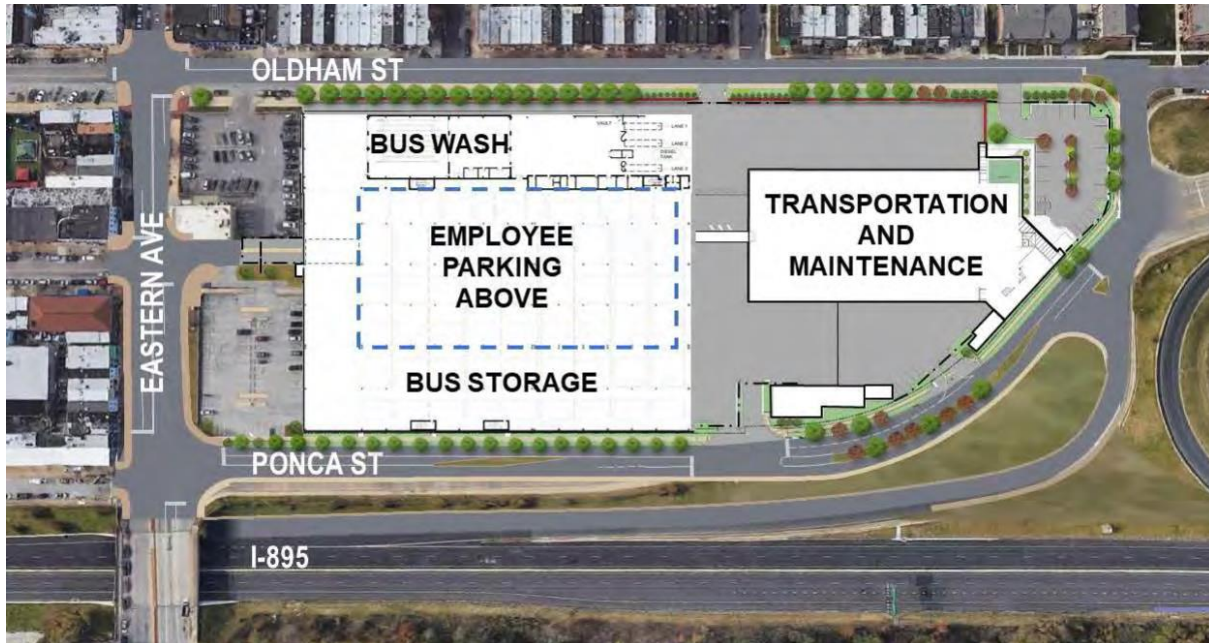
Eastern Bus Division Reconstruction Project site plan.
